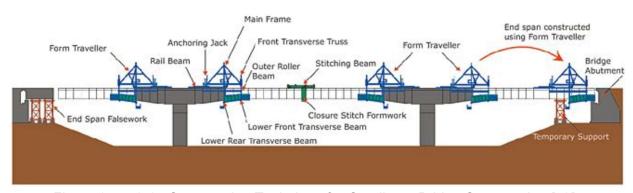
Construction Technique for Cantilever Bridge Construction [53]
